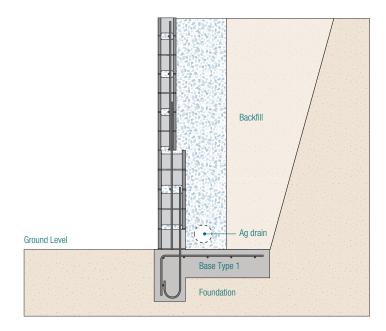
Typical Wall Layout for Base Type 1 (ensure adequate drainage)
